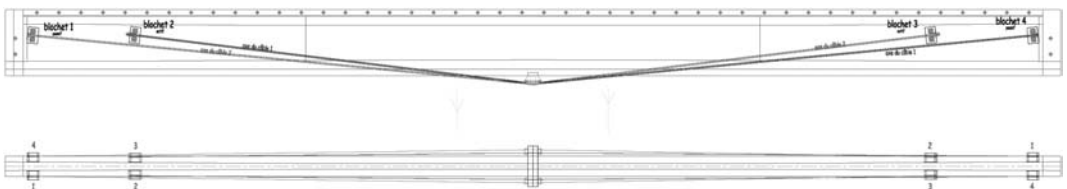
Installation of additional tendons with their dead and active anchoring block.
